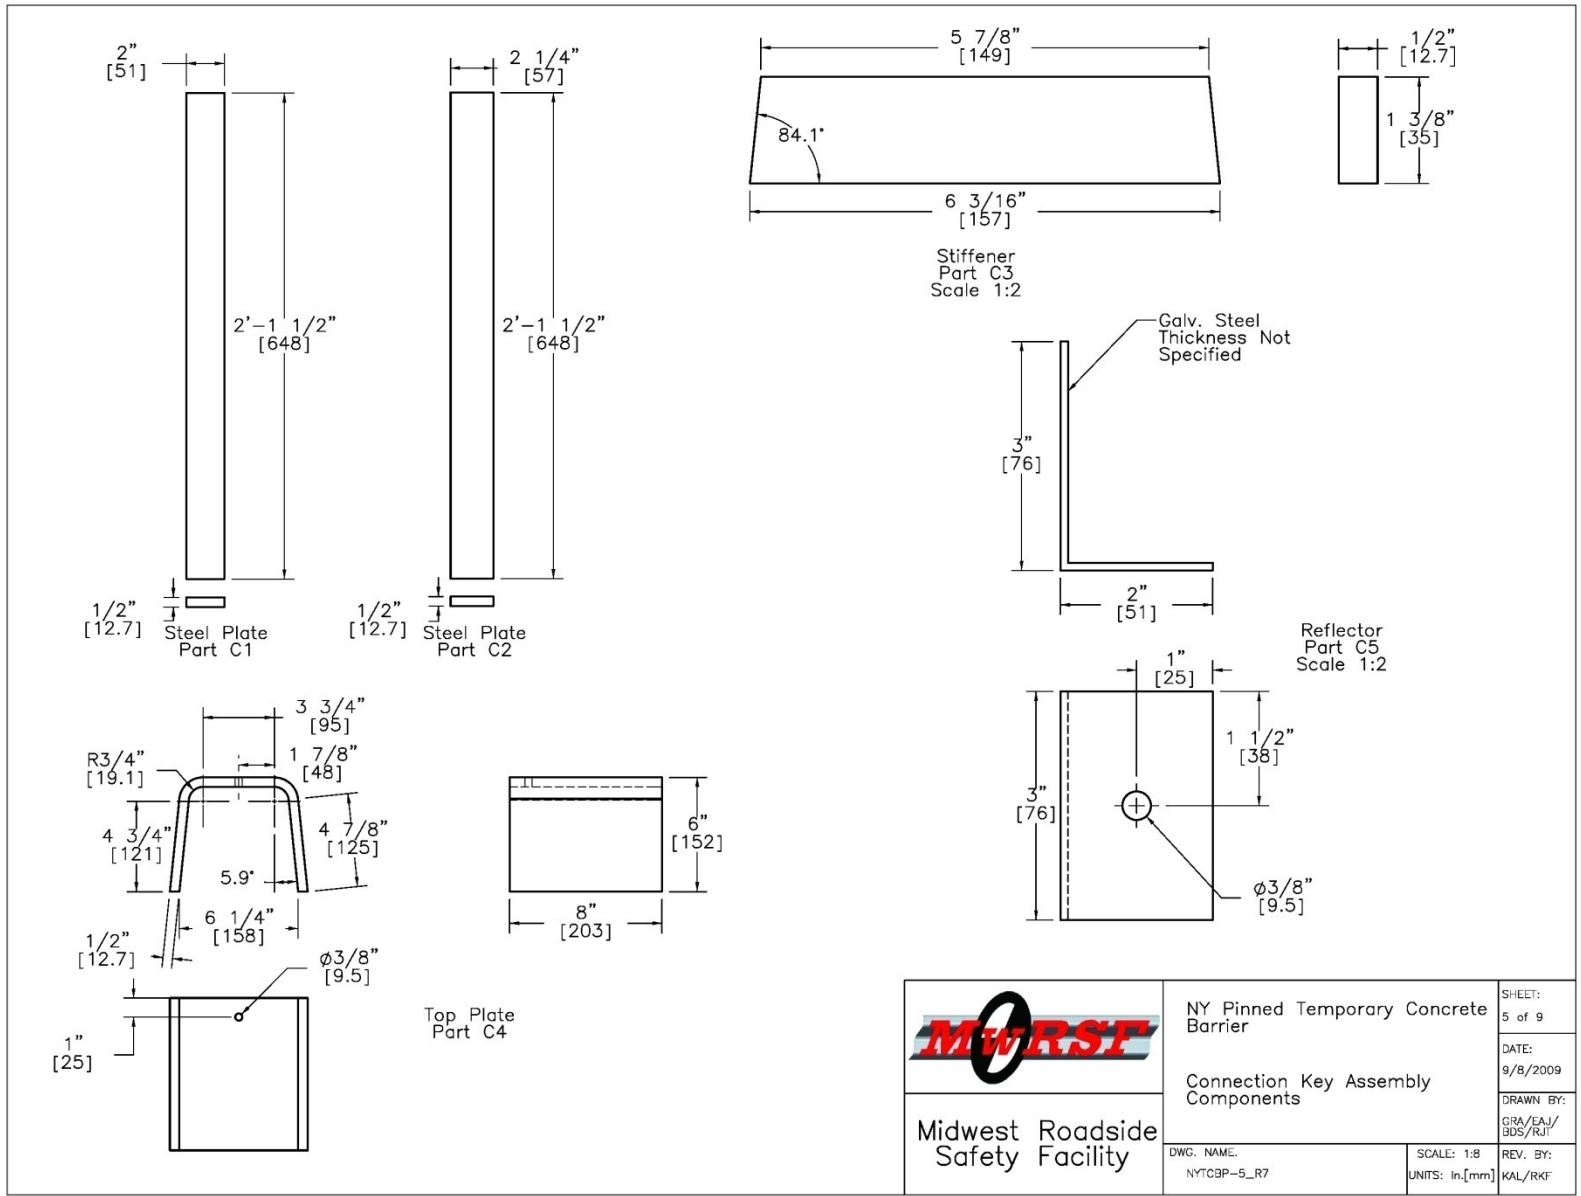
Connection Key Assembly Details, Test No. NYTCB-5
